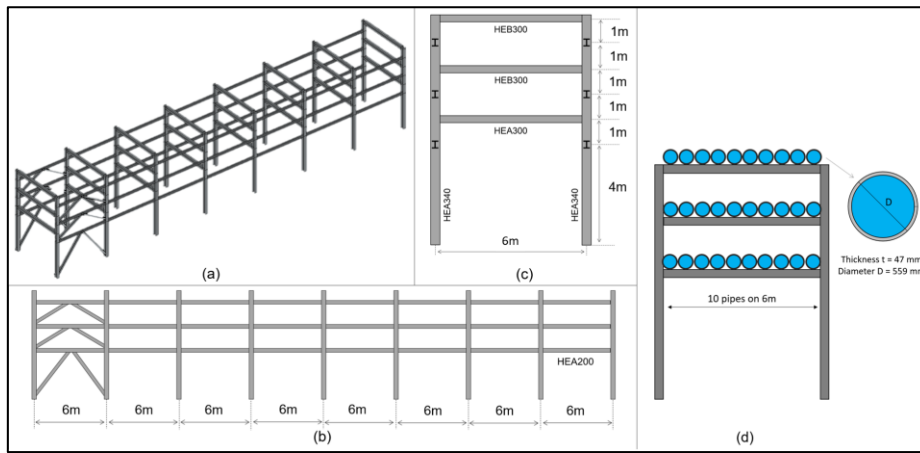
Prototype steel pipe-rack: (a) 3D view; (b) Longitudinal view; (c) Transversal view; (d) 22” DN550 SCH140 pipe arrangement
